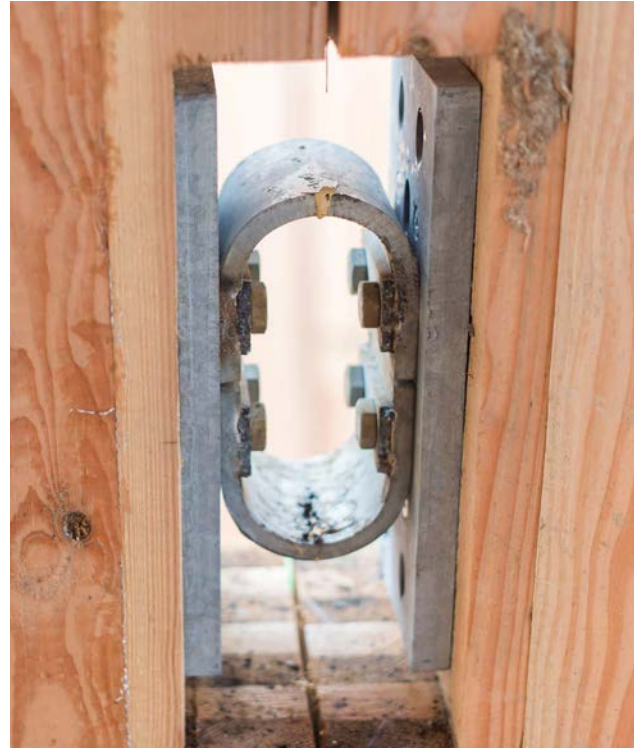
ROCKING SHEAR WALL FUSE
